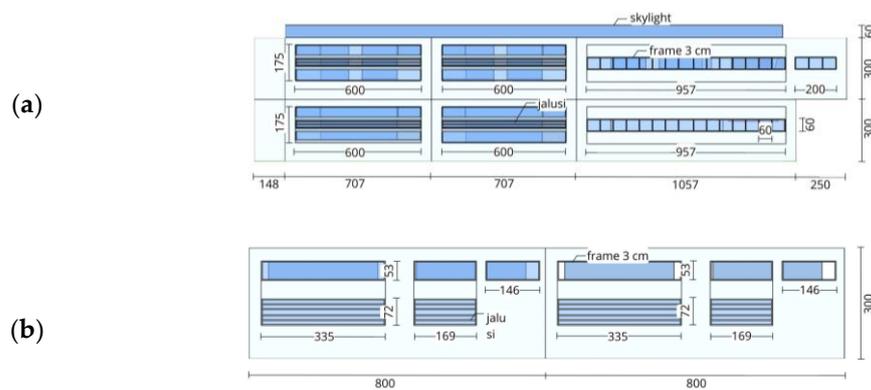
(a) Addition and resize of west building windows ; (b) Addition and resize of south building windows.
